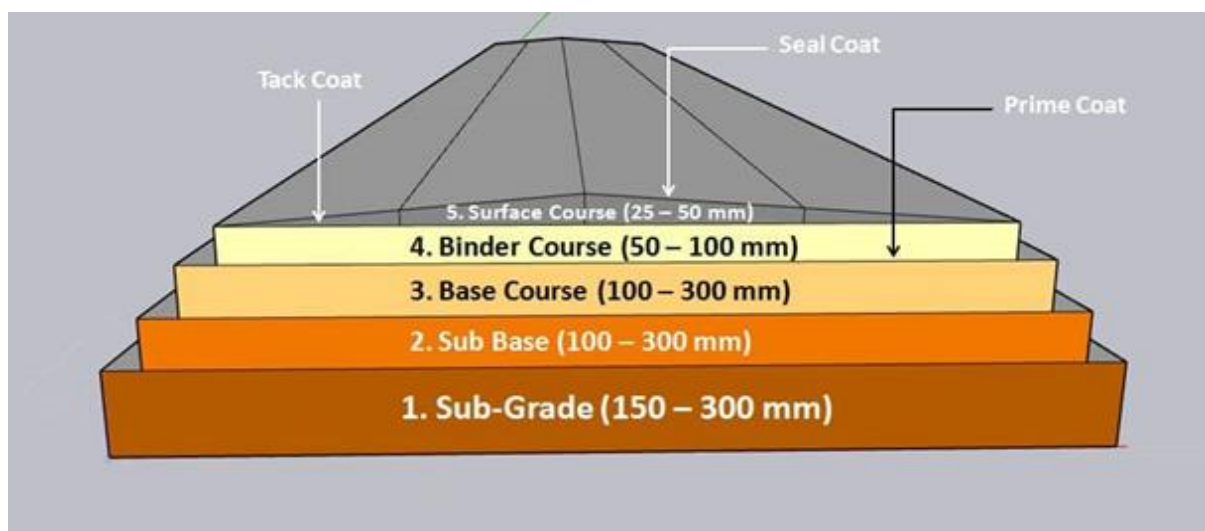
Pavement structure. The pavement structure consists of five components: the subgrade, subbase course, base course, binder course and surface course. *Note.* From *Flexible Pavement Road Construction Layers*, by B. Mahajan, 2021.
